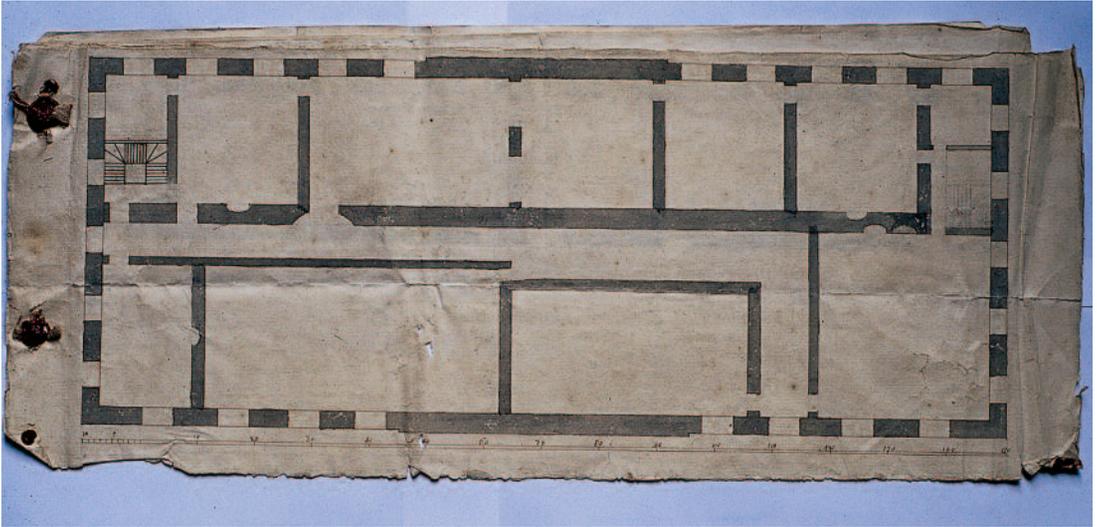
Kiveton Park, basement plan, contract drawing by Daniel Brand, 1698.
